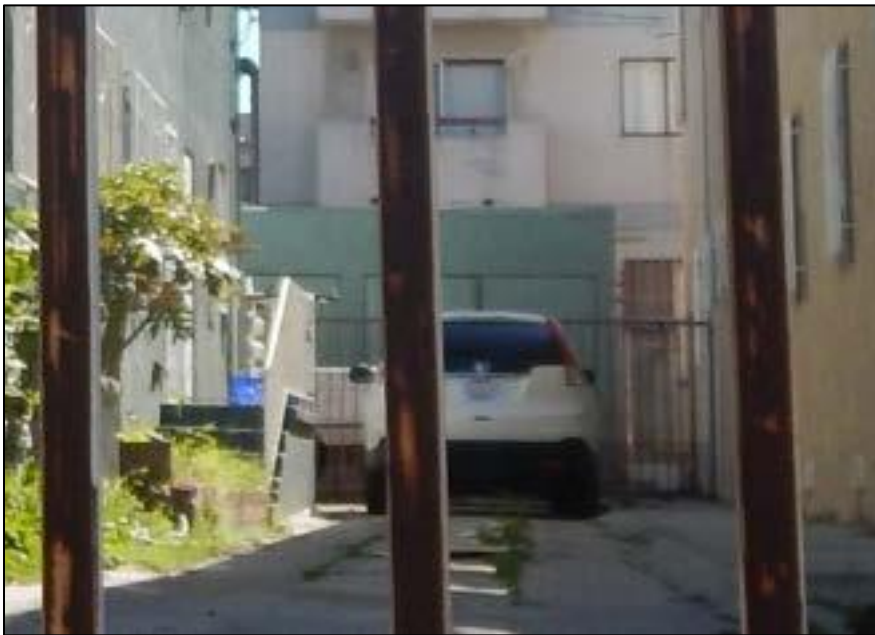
812-814 South Mariposa Avenue., north elevation
